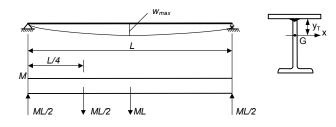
Calculation of the maximum deflection for a simply supported welded beam of constant cross-section
